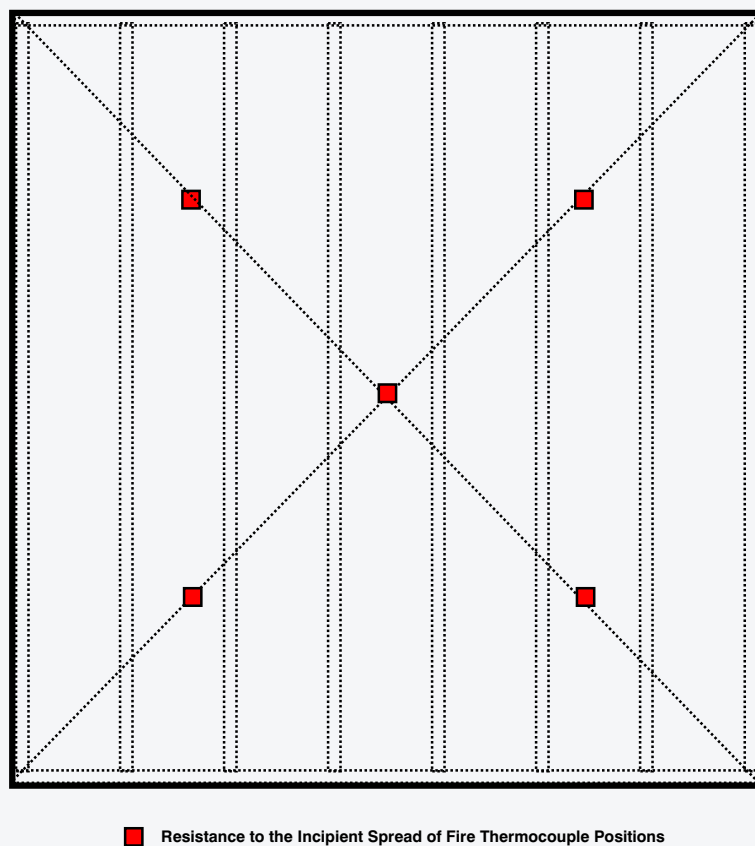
Elevation of a wall showing RISF thermocouple positions.
